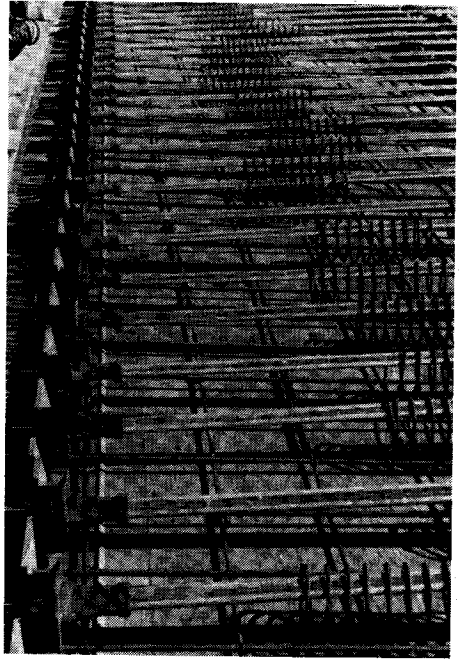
Confinement anchorages for transverse deck post-tensioning installed in deck slab.
